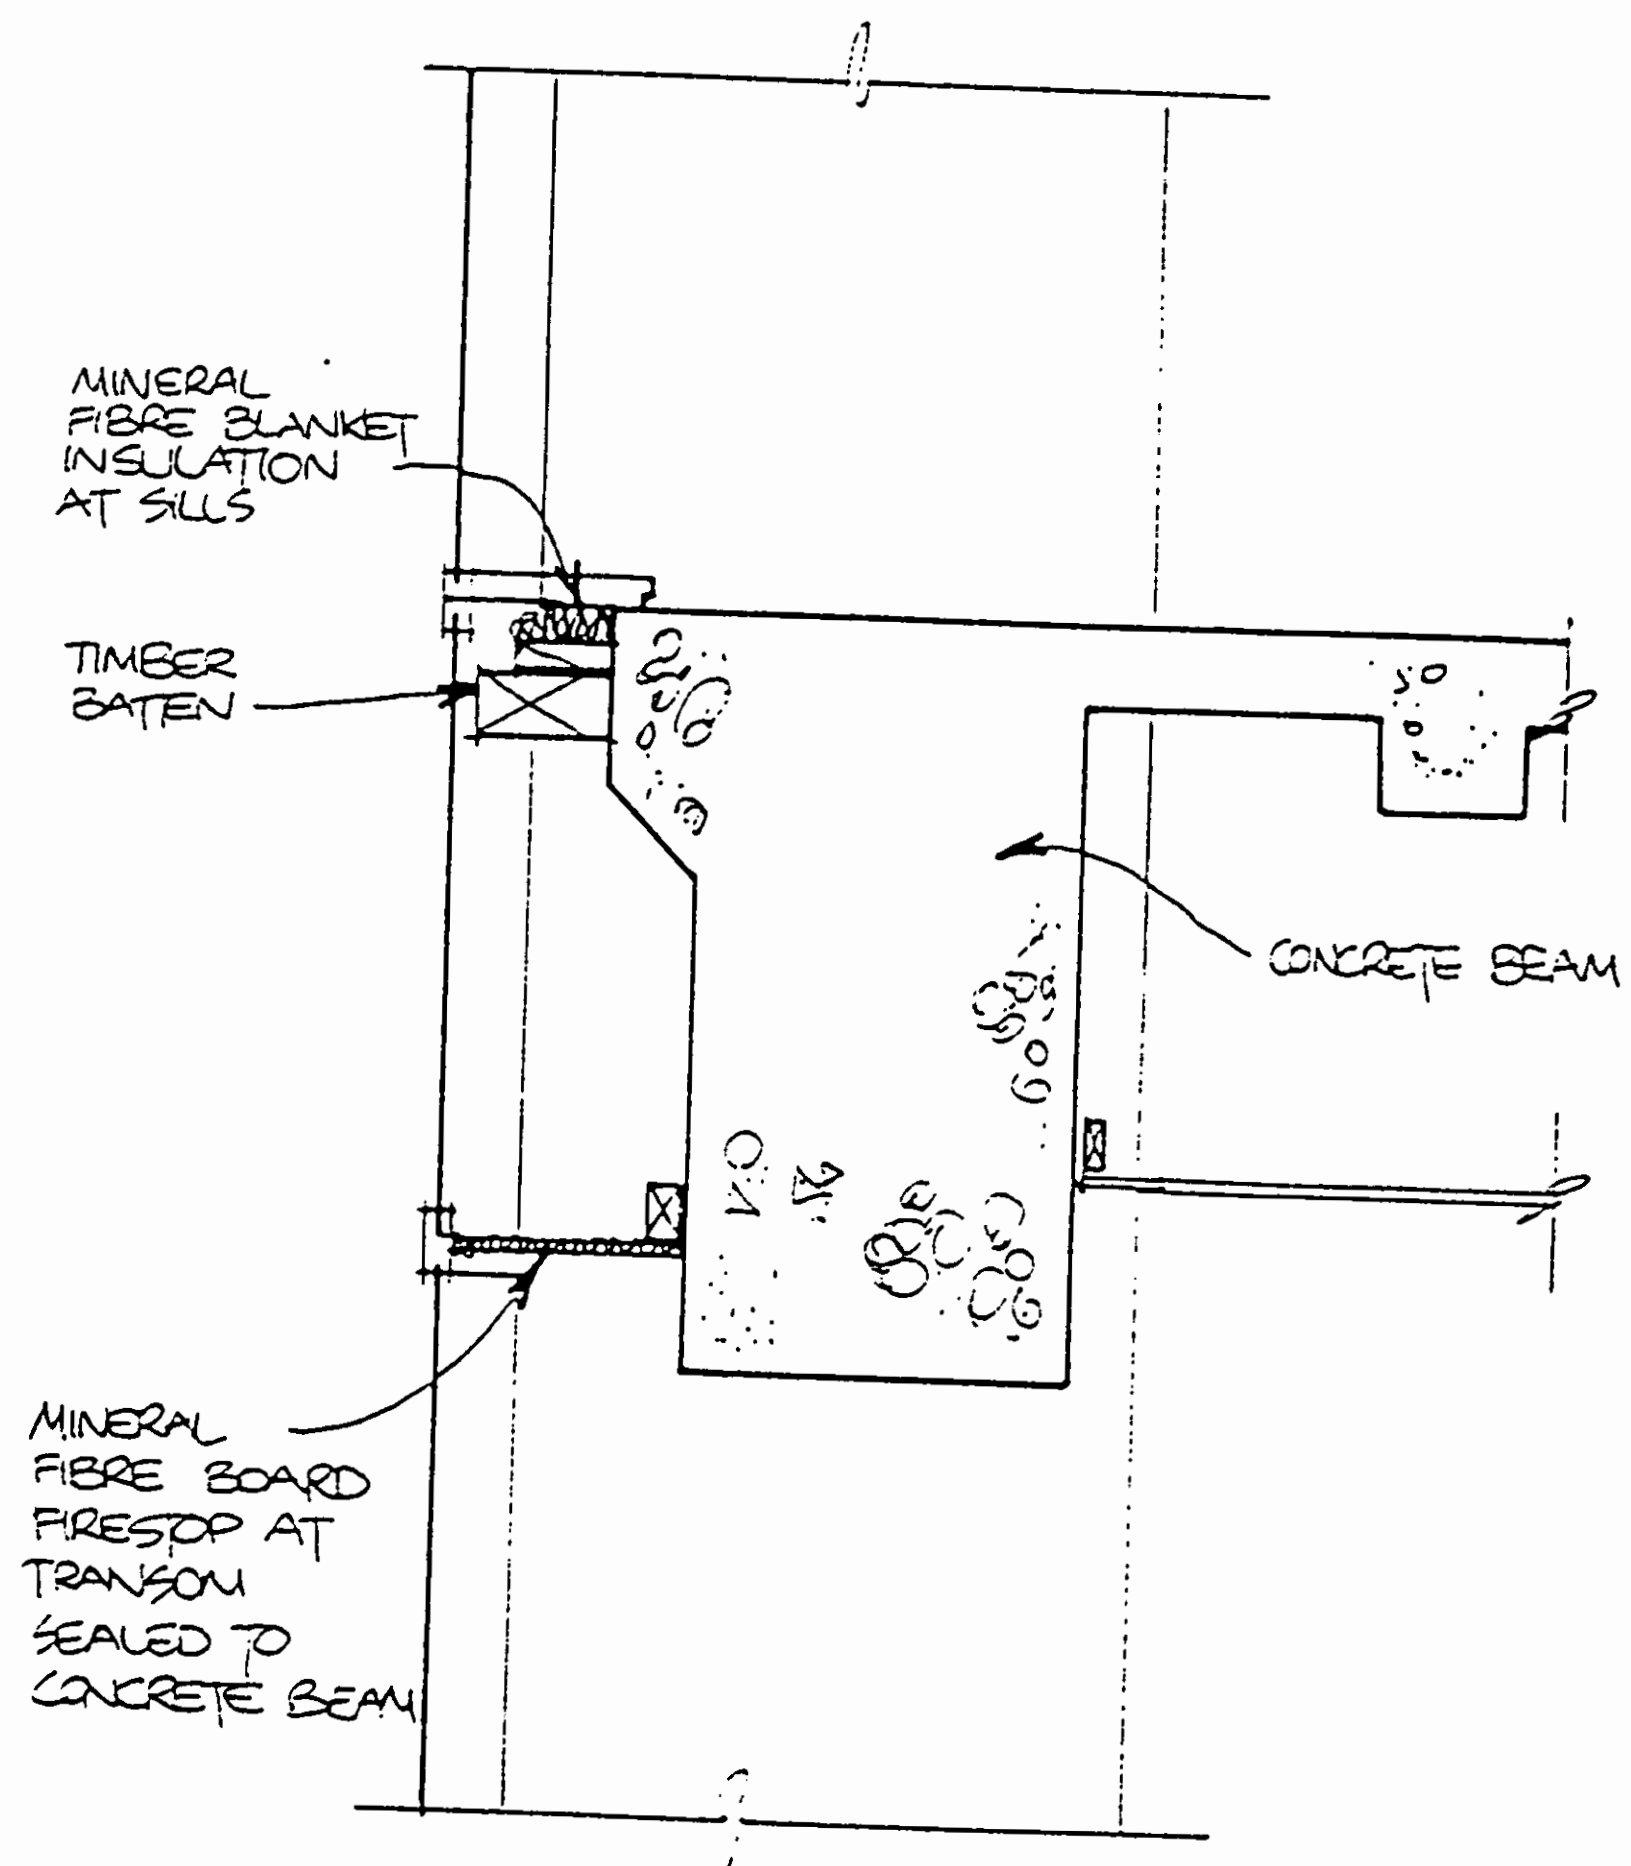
(c): SECTION THROUGH CONCRETE FRAMED, ALUMINIUM AND GLASS CURTAIN WALL BUILDING
